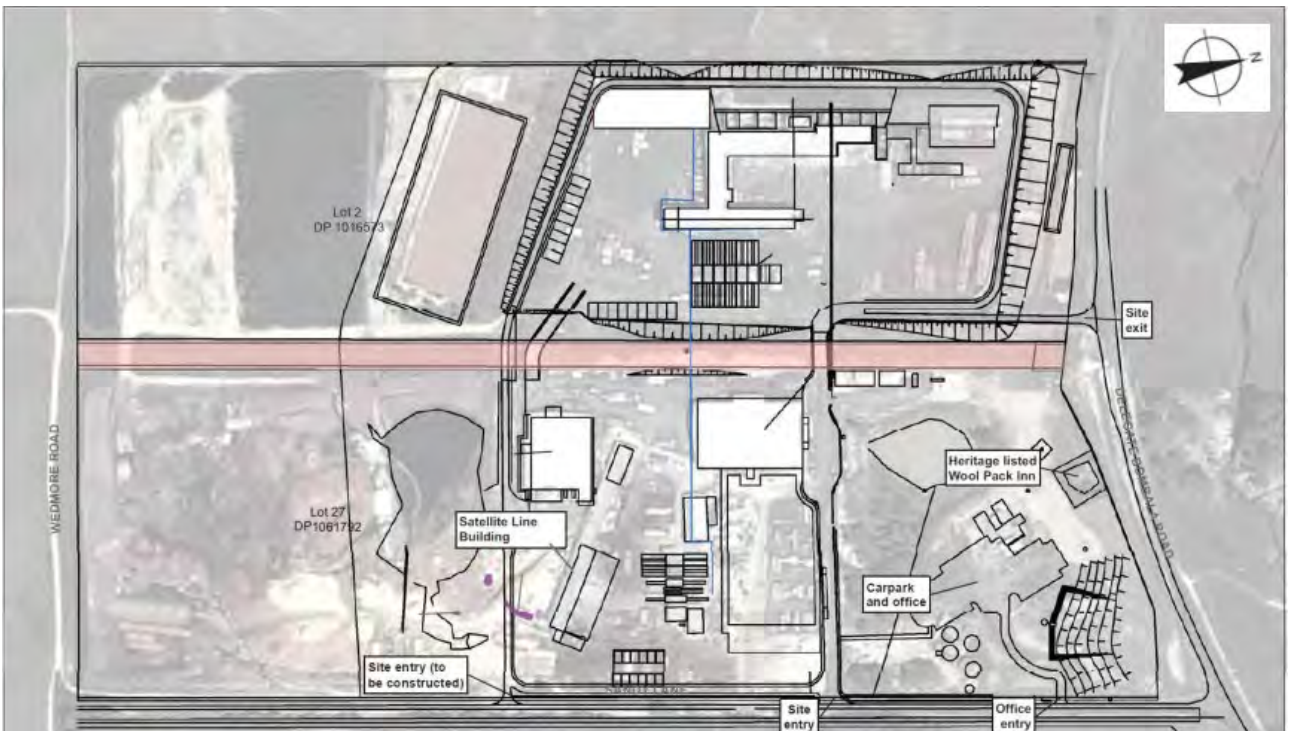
Site Layout (Source: DWAU Sawmill, Bombala Modification 4 Assessment Report, April 2020).
